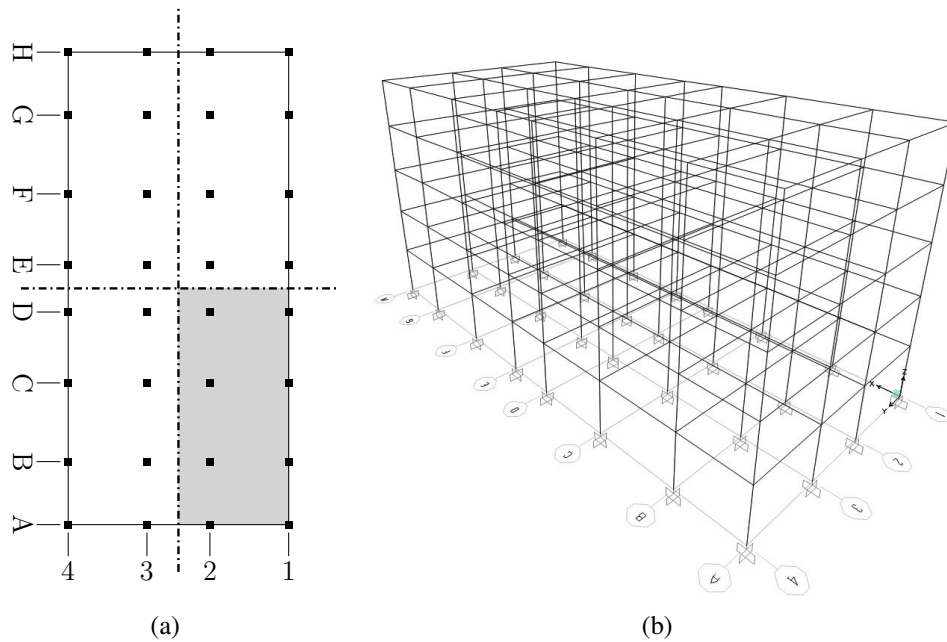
(a) Plan view of the schematic of the reinforced concrete frame structure; (b) perspective of the frame structure.
